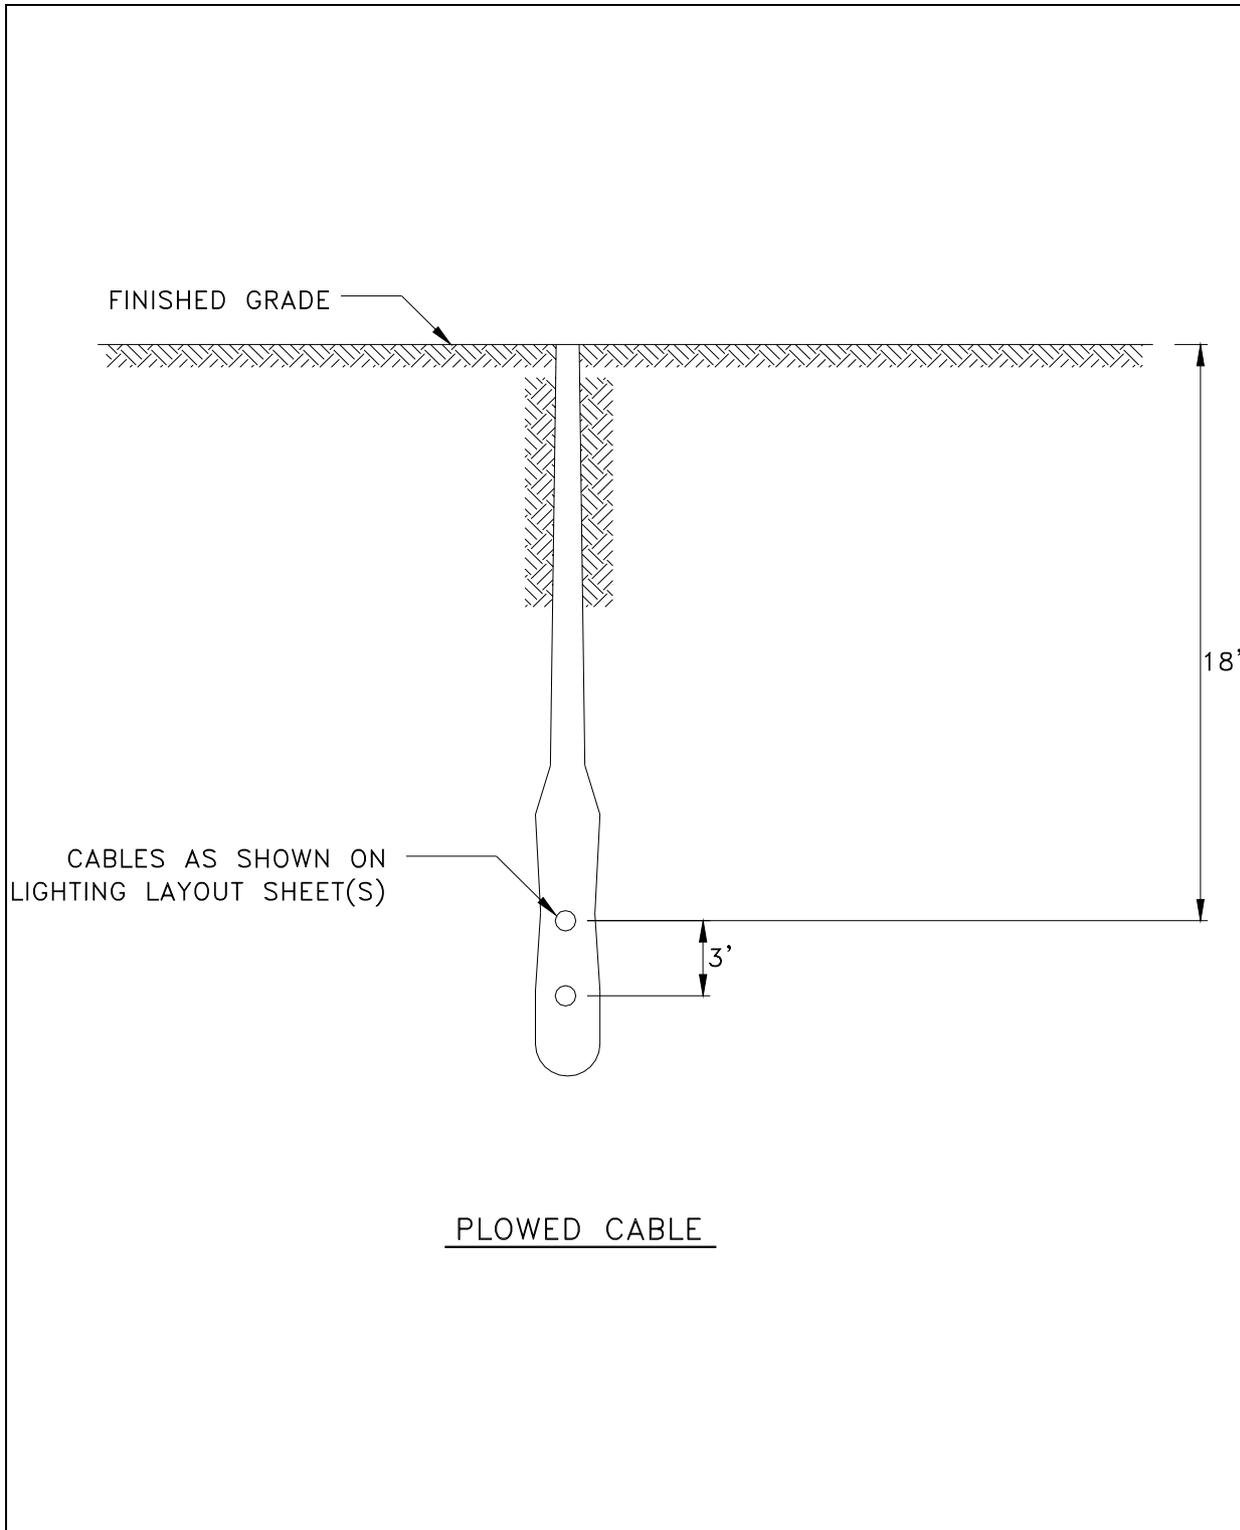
Standard Details for Underground Cable Installation –Plowed Cable
